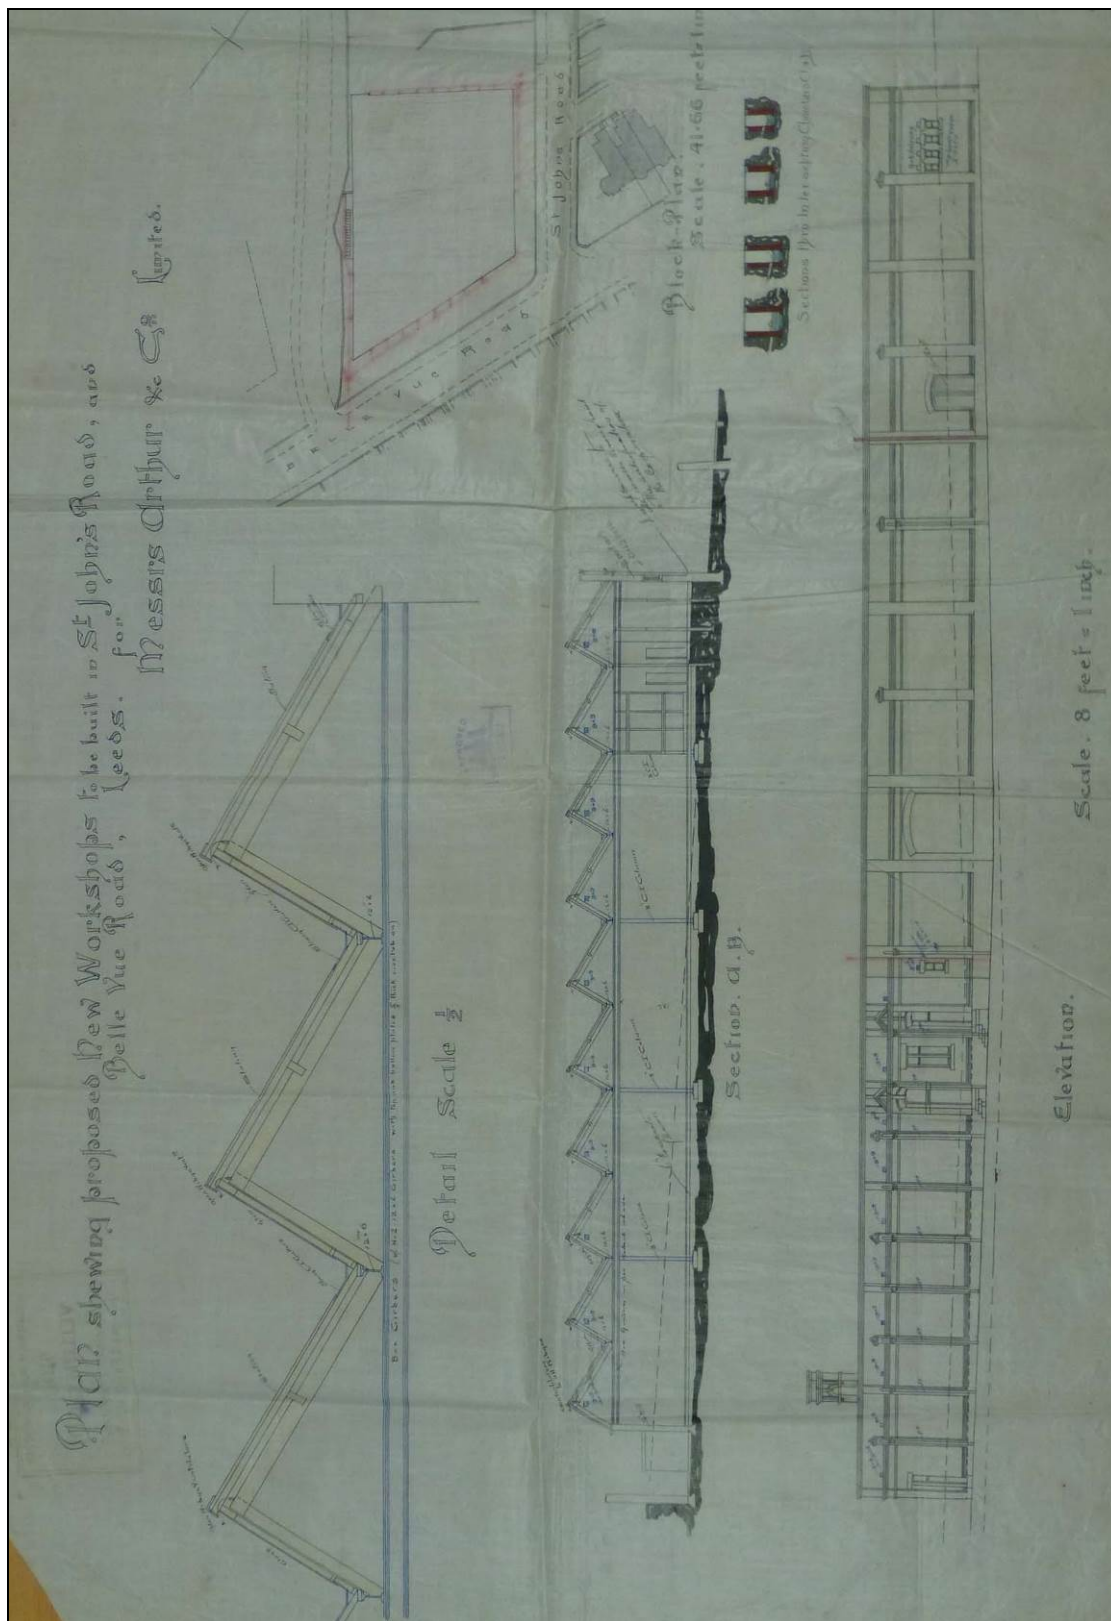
'Plan shewing proposed New Workshops' for Messrs Arthur and Co. Ltd dated 1902 (Leeds Archives Ref: LC/ENE/BCP no.101)
